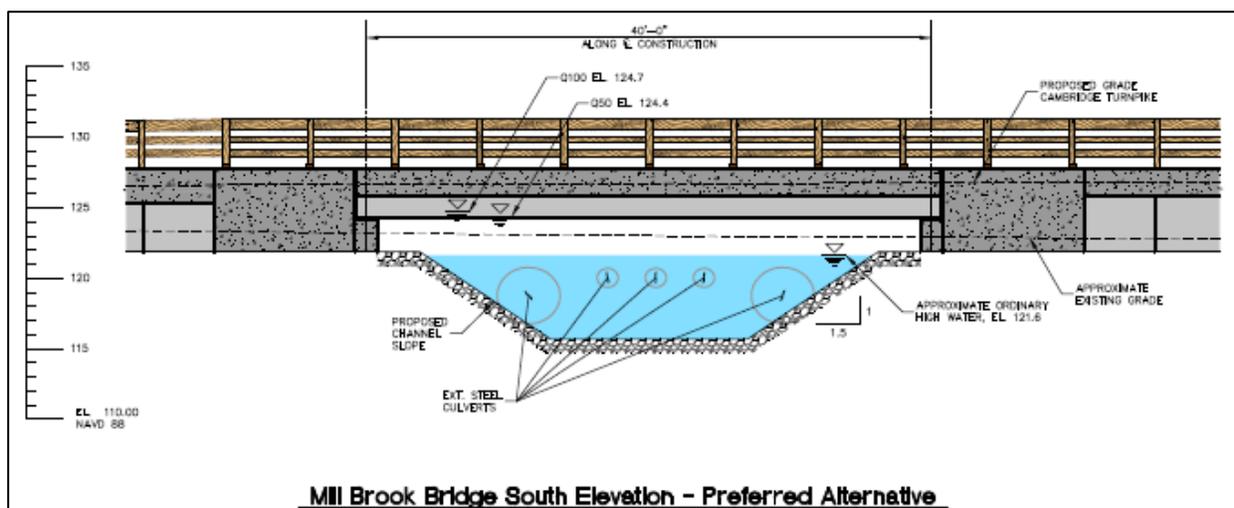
Mill Brook Bridge South Elevation – Preferred Alternative
